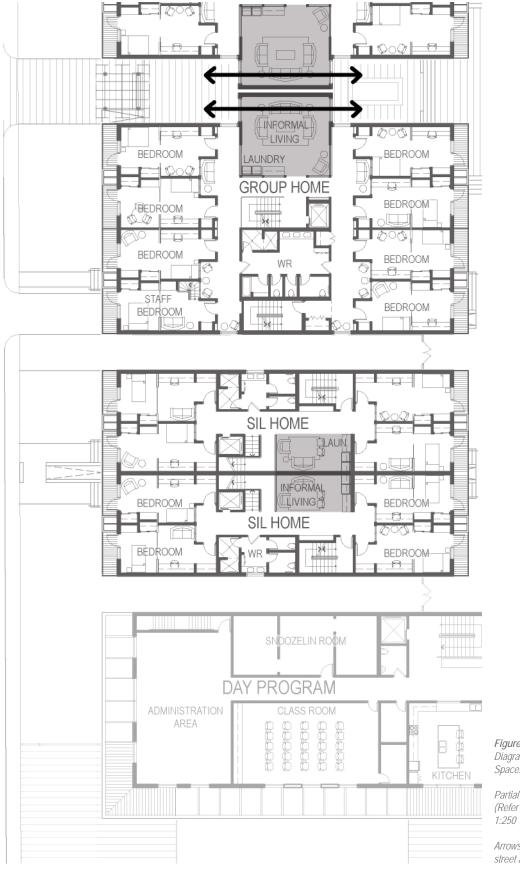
Diagram Highlighting Shared Living Spaces on Second Floor.
